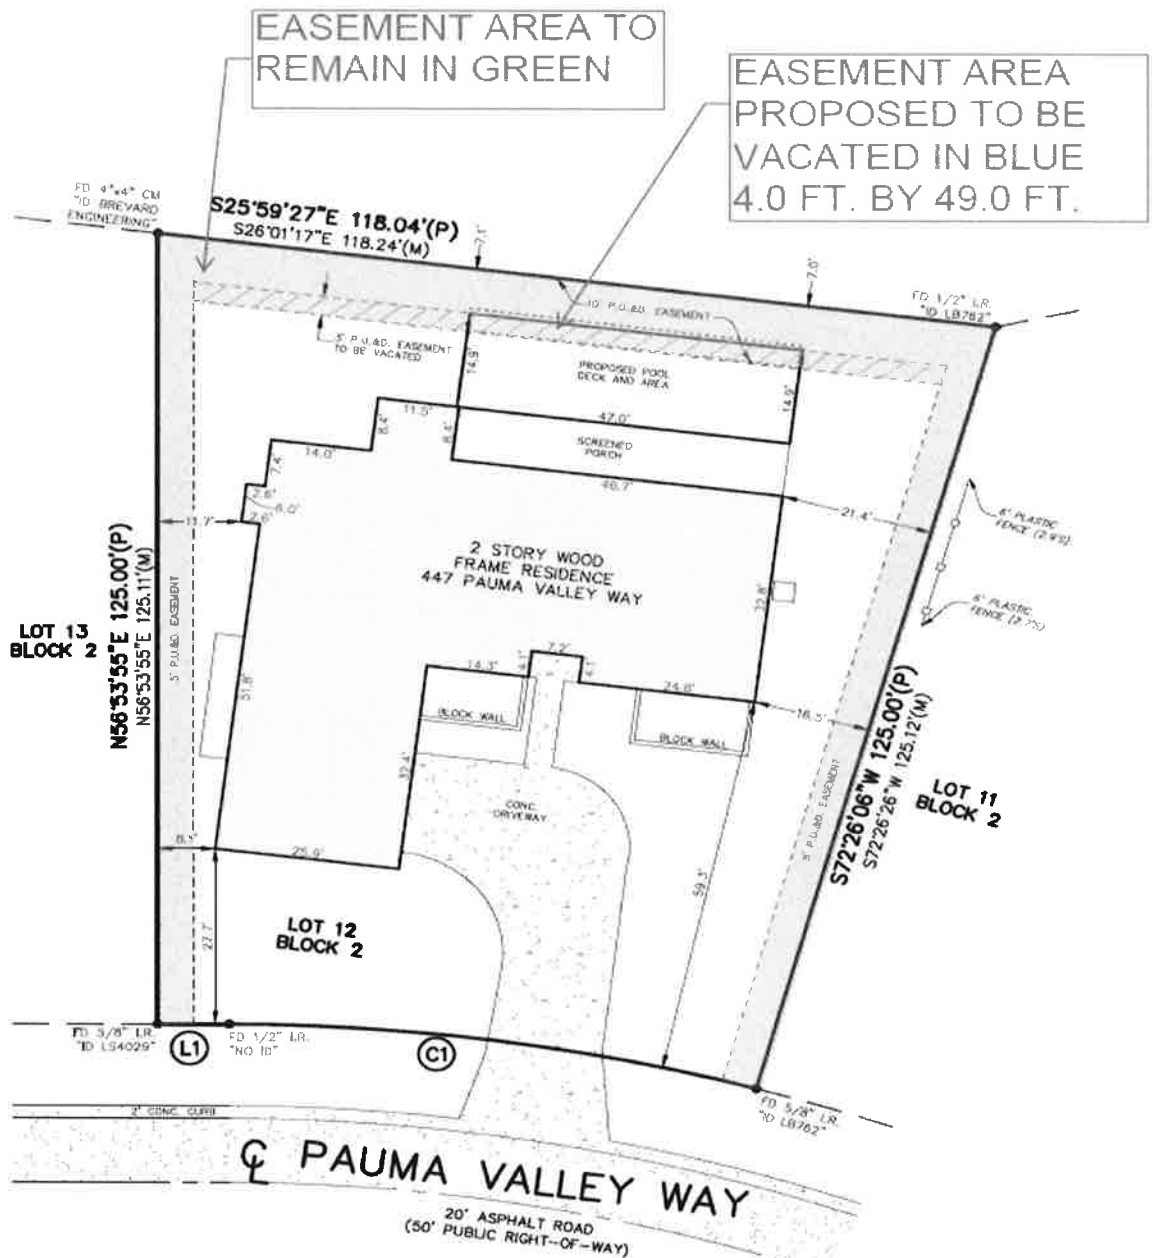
Copy of proposed pool plan 15 feet by 49 feet. Area highlighted in blue is proposed to be vacated to allow for construction of a pool. Area in green shows easement that will remain.
